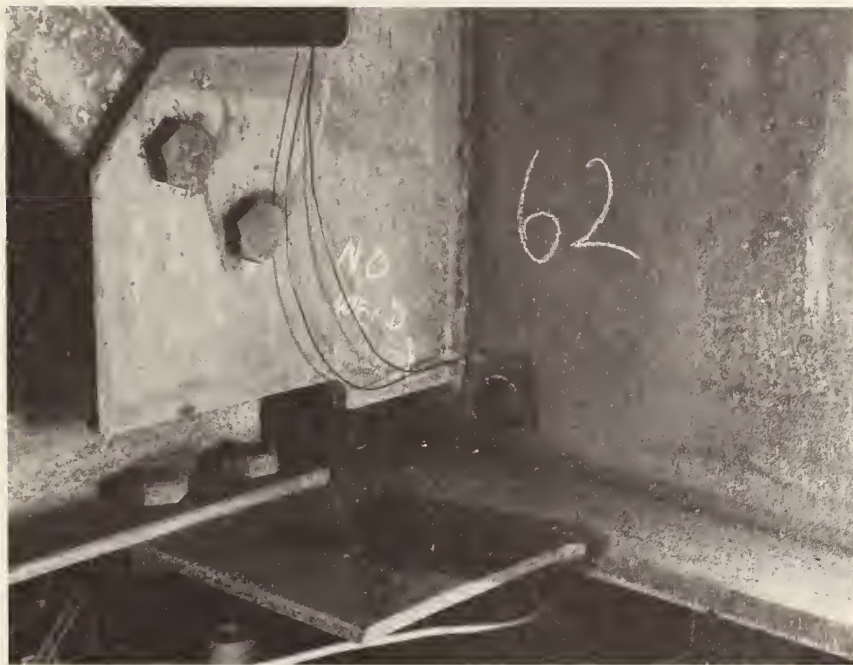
Strain Gages Adjacent to Welded Detail
